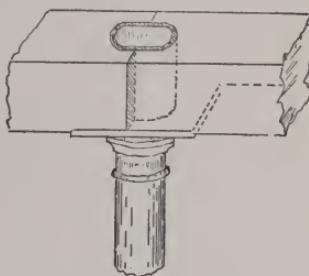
FRAMING OF A GIRDER AROUND AN IRON COLUMN.
